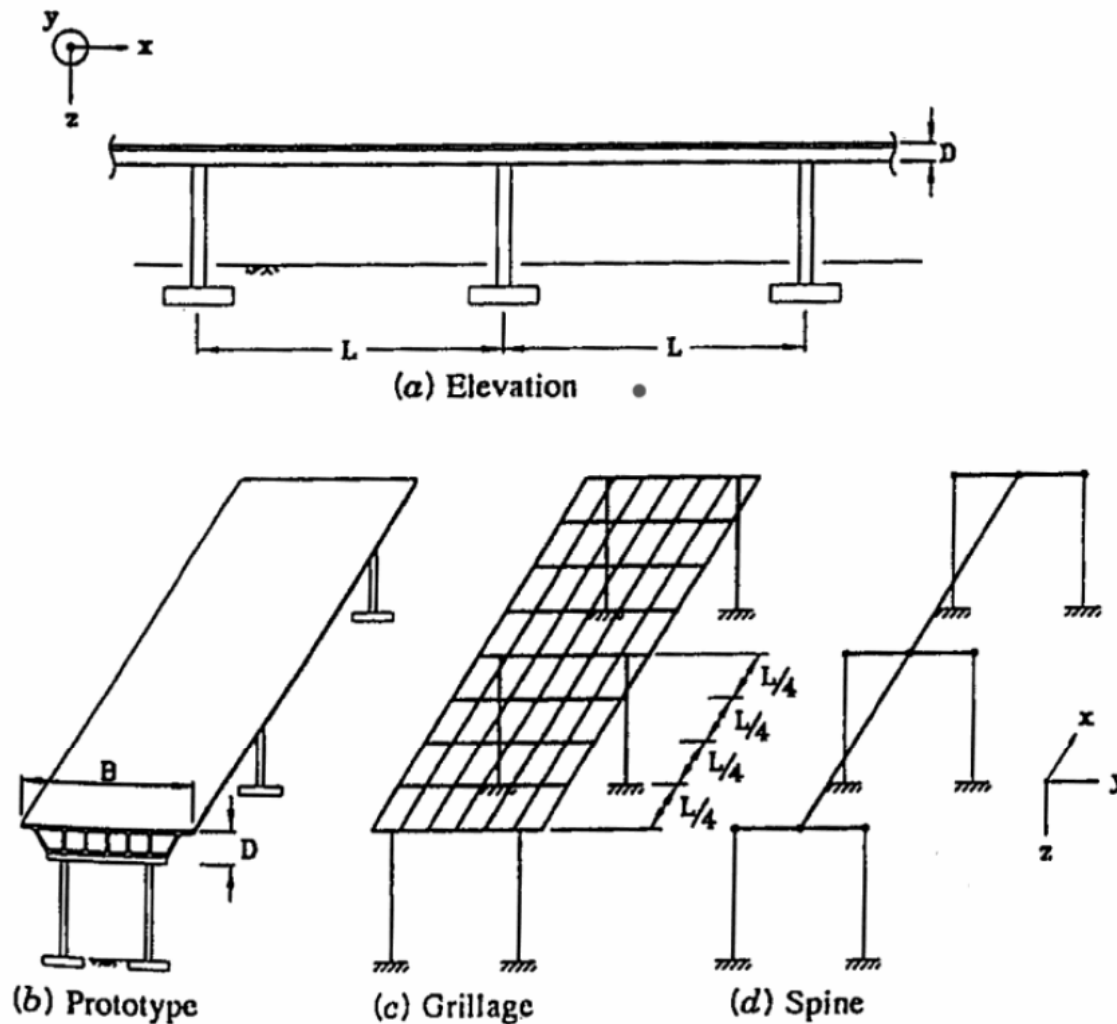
Superstructure Models (Priestley, et al 1996).
